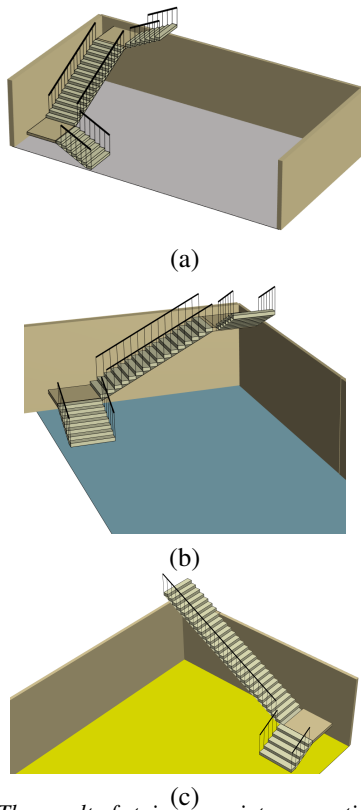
The result of staircase points separation for TUM Building 1 dataset: (a) floor-2, (b) floor-3, and (c) floor-4.
